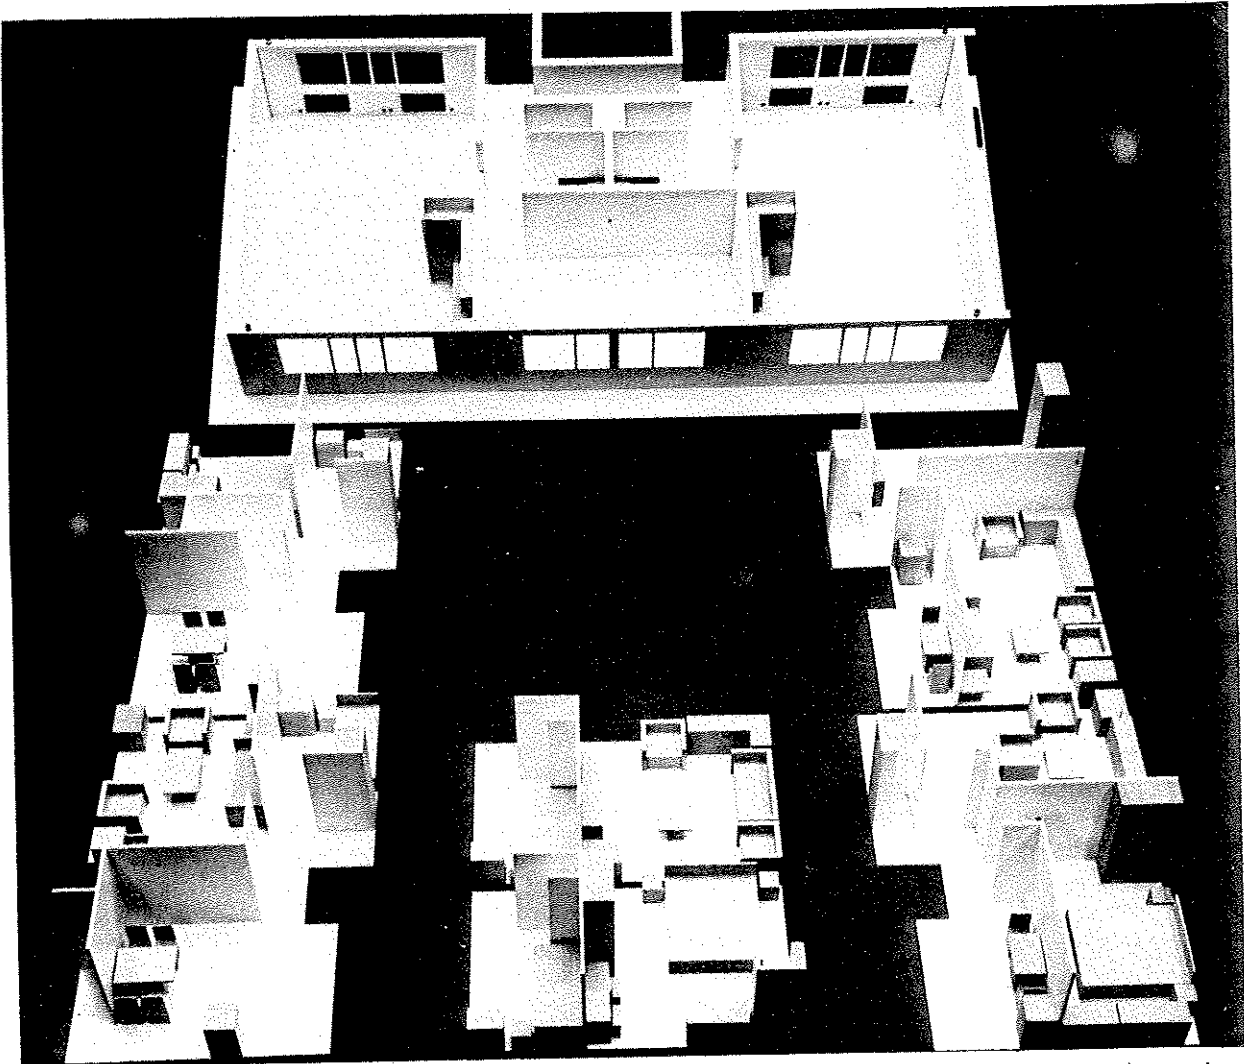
Models of alternative arrangements proposed by tenants (two samples for each apartment are shown).
